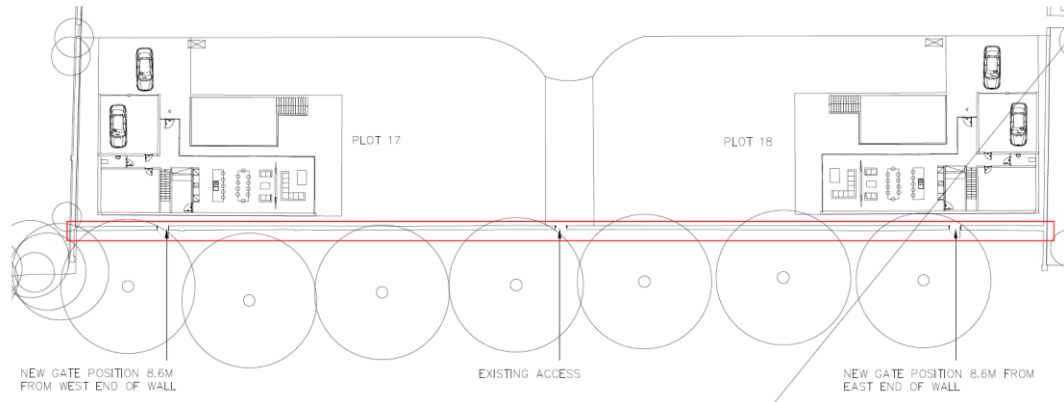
Proposed site plan showing the new openings in conjunction with the dwellings, indicating the doors would be concealed from view
